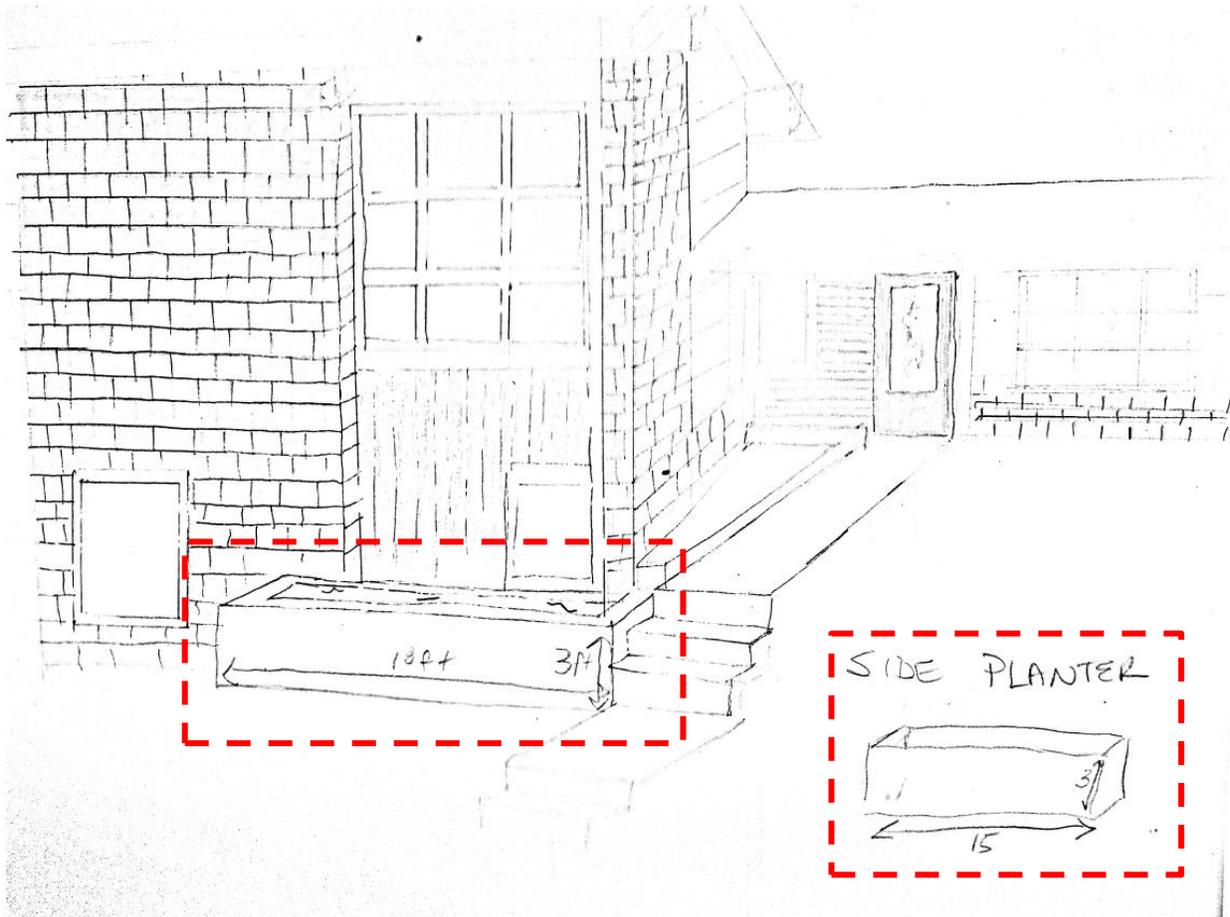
DETAIL OF WEST (FRONT) PLANTERS PRIOR TO REMOVAL
